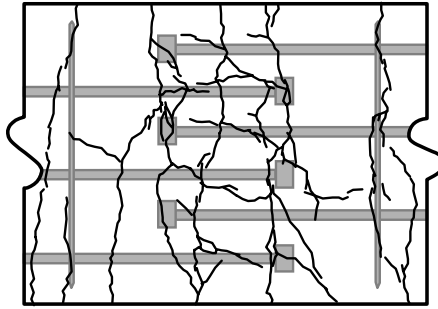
Crack development in a typical unconfined lap splice test (specimen LS-08-04.04-12-10(N)-1) (continued)
